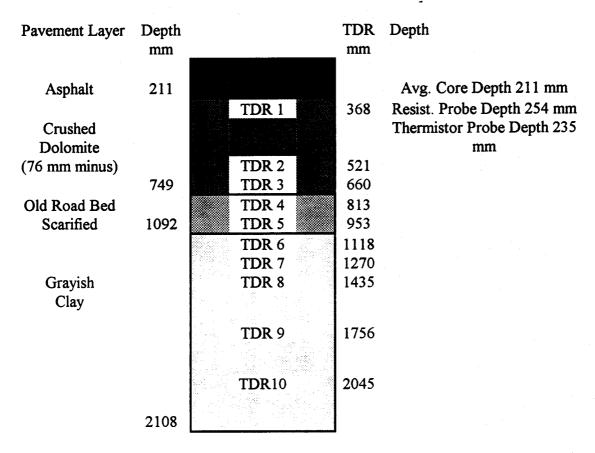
Profile of Pavement Structure and Probe Depths from Surface, Station 0-15
